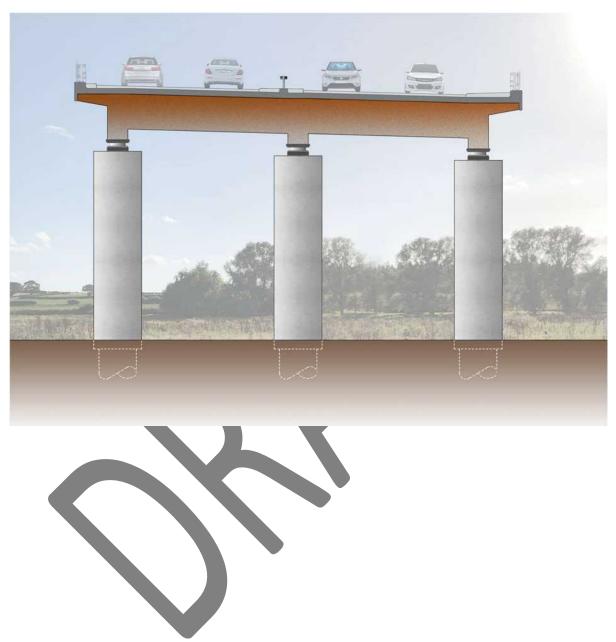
Typical Greenbridge Design Cross Section (Where NMU access is provided)
